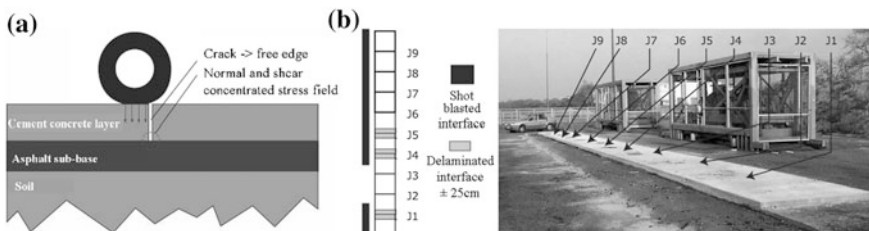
Location of stress singularities at the interface near a crack on a loaded composite pavement structure a composite pavement test section and the two FABAC devices (b) [9]
